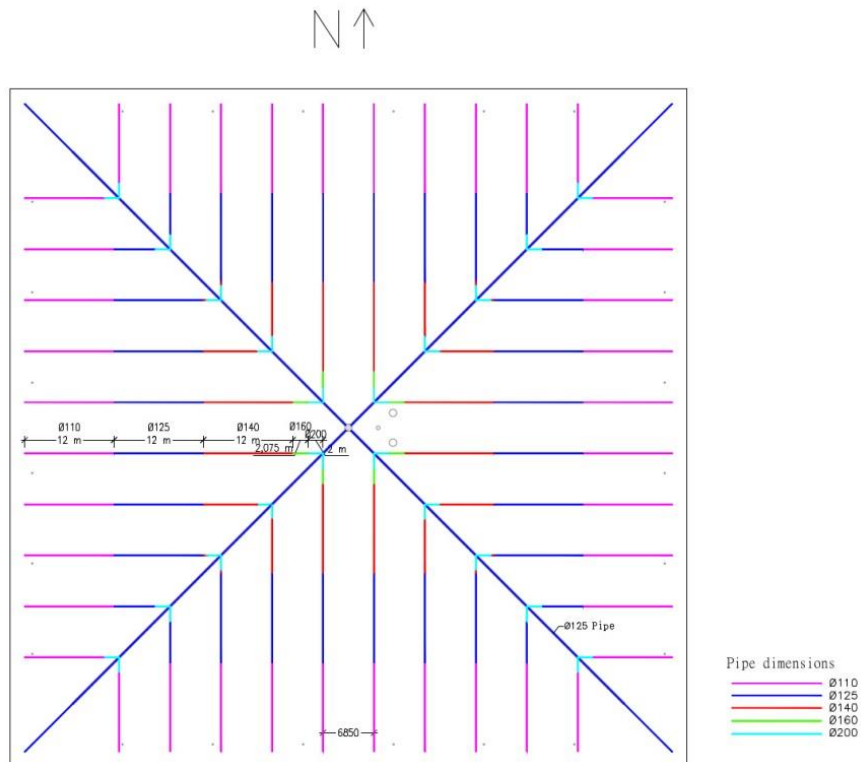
Example of a weight pipe layout on top of the cover (PlanEnergi)
